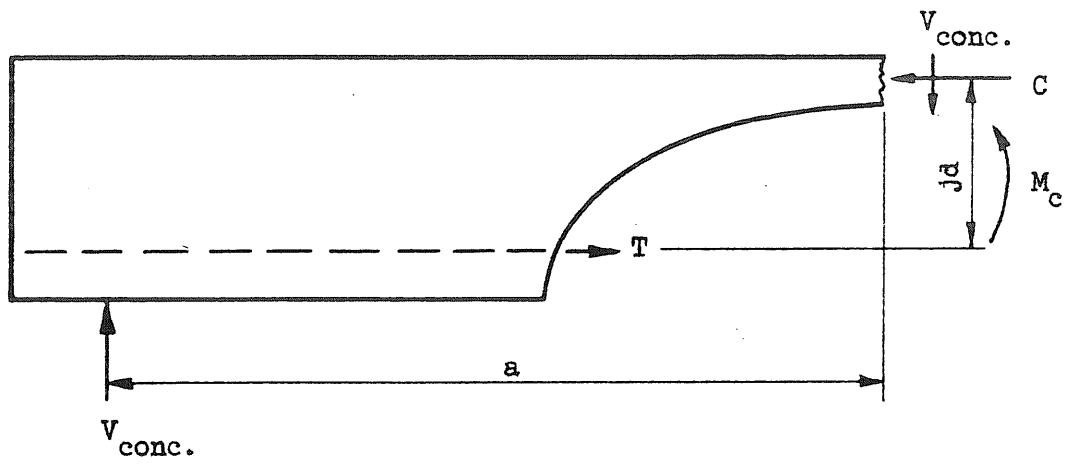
FORCES ACTING IN A BEAM WITH AN INCLINED CRACK
